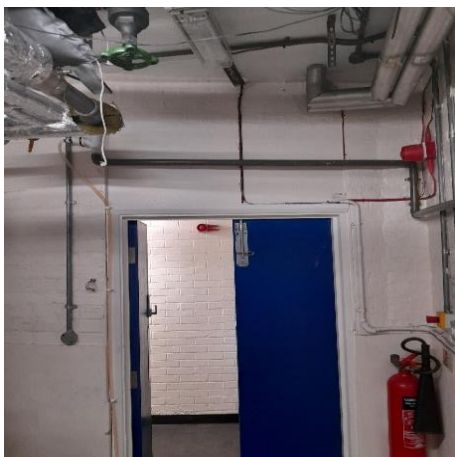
Piped Services Penetrations to Above in Boiler Room
